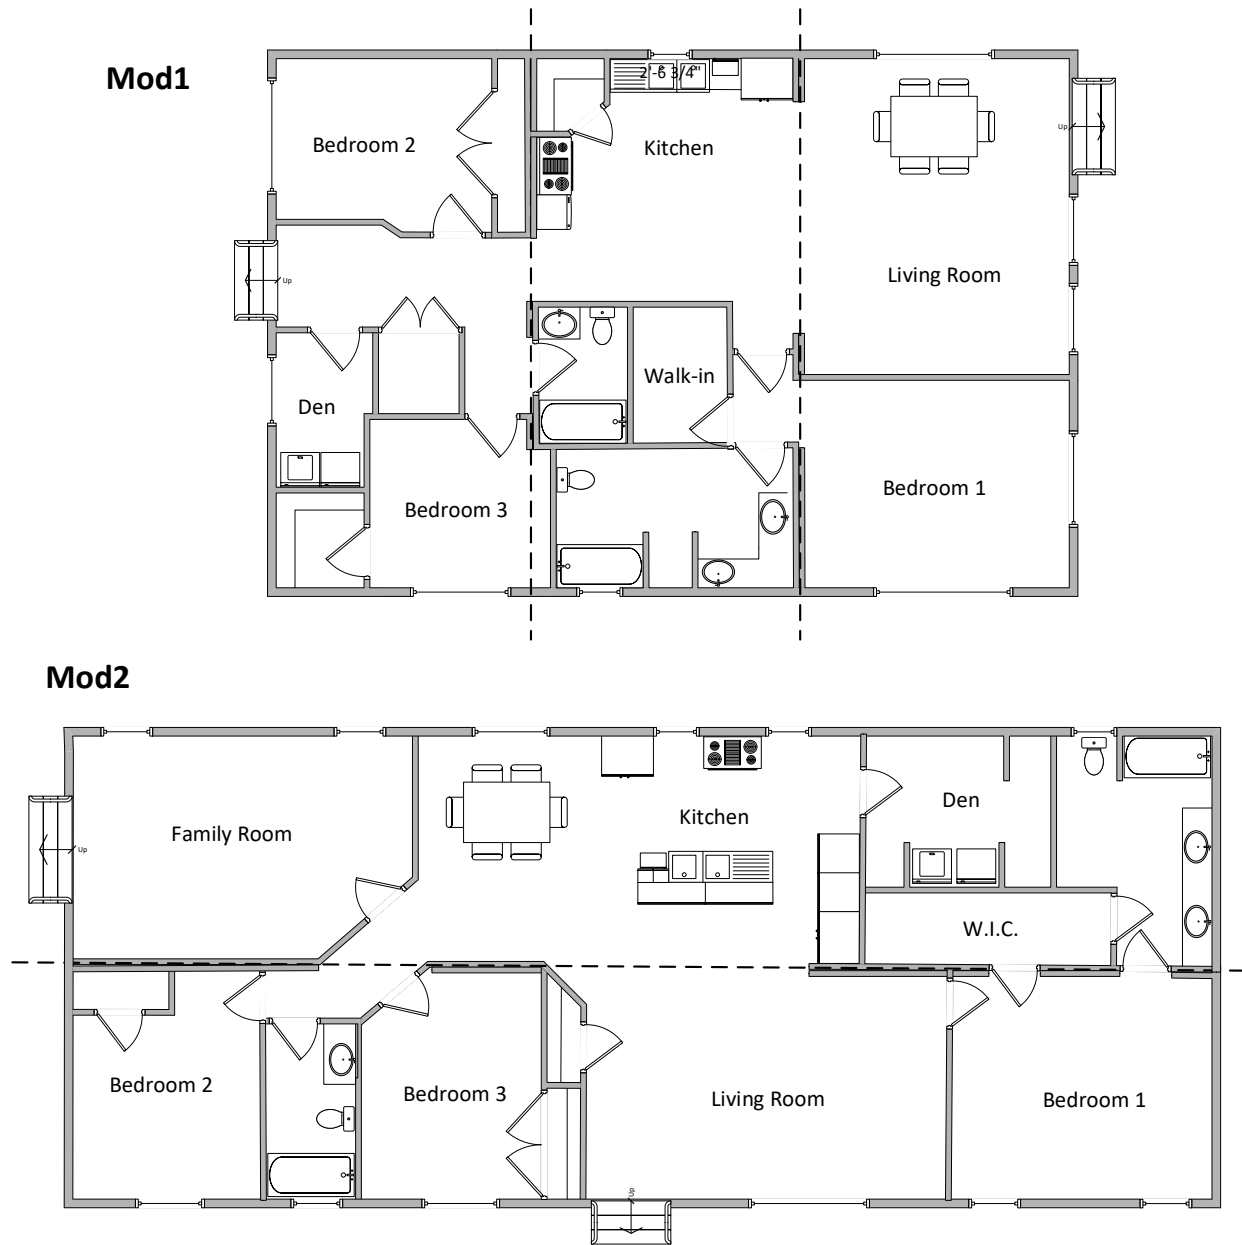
Floor plans of the case study modular buildings (Mod1 and Mod2)
